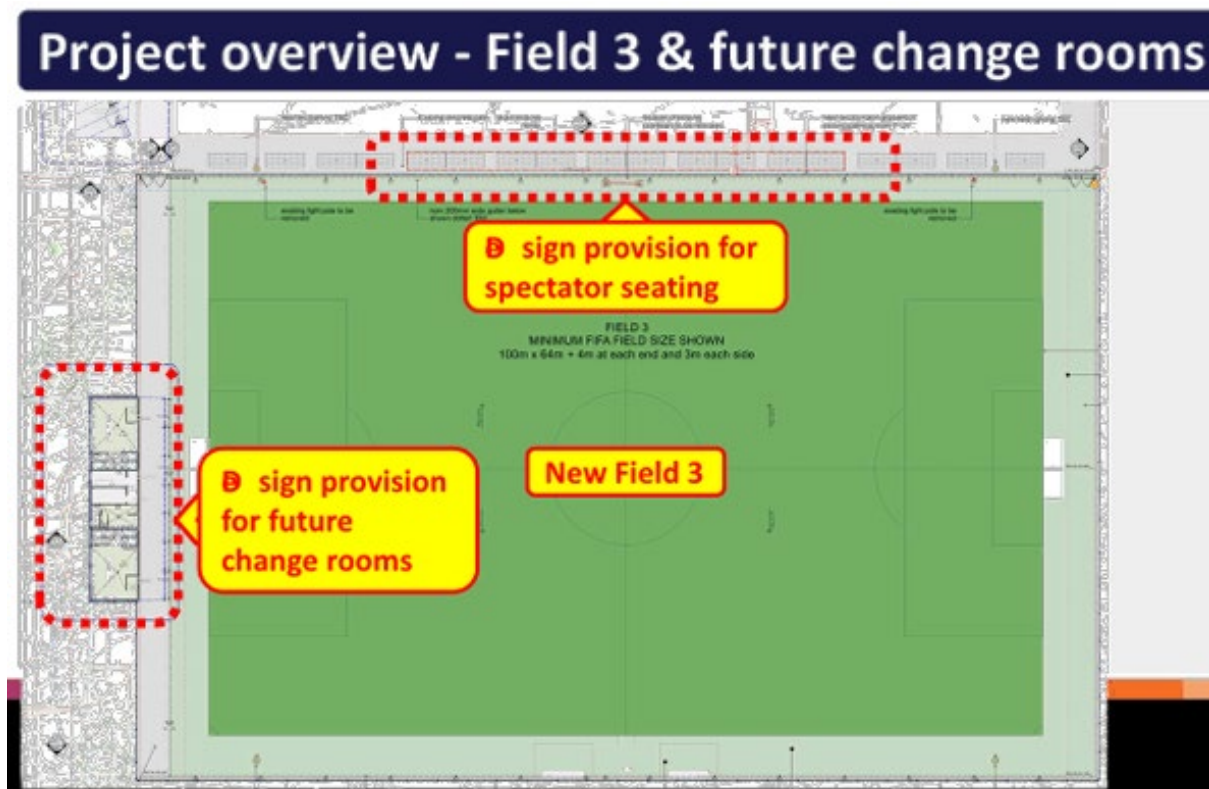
shows the new Field 3 and upgraded entry and circulation to Christie Park.
